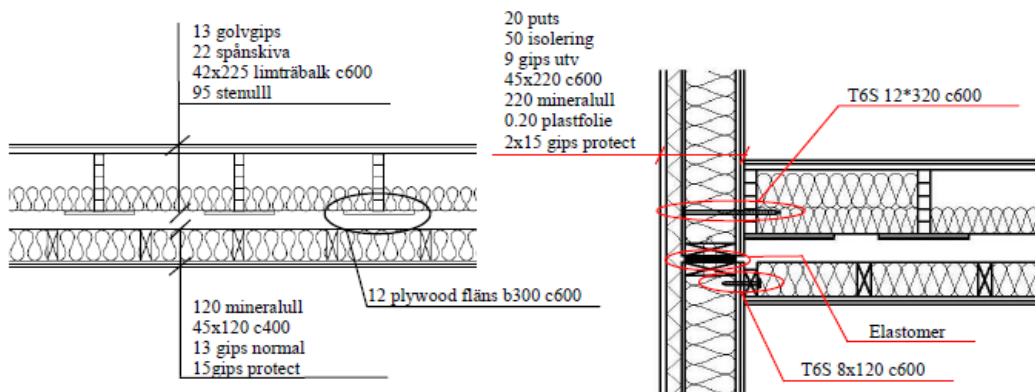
Floor/Ceiling drawings (left) and assemblage with the façade element, the so-called outer-wall (right).
